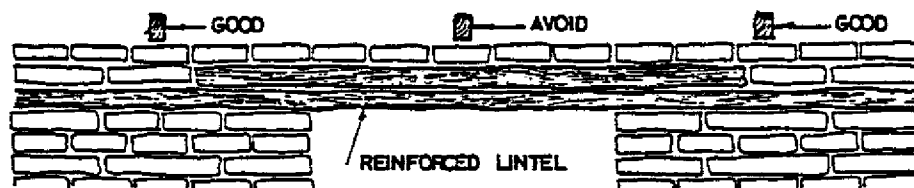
REINFORCING LINTEL UNDER FLOOR BEAM .
